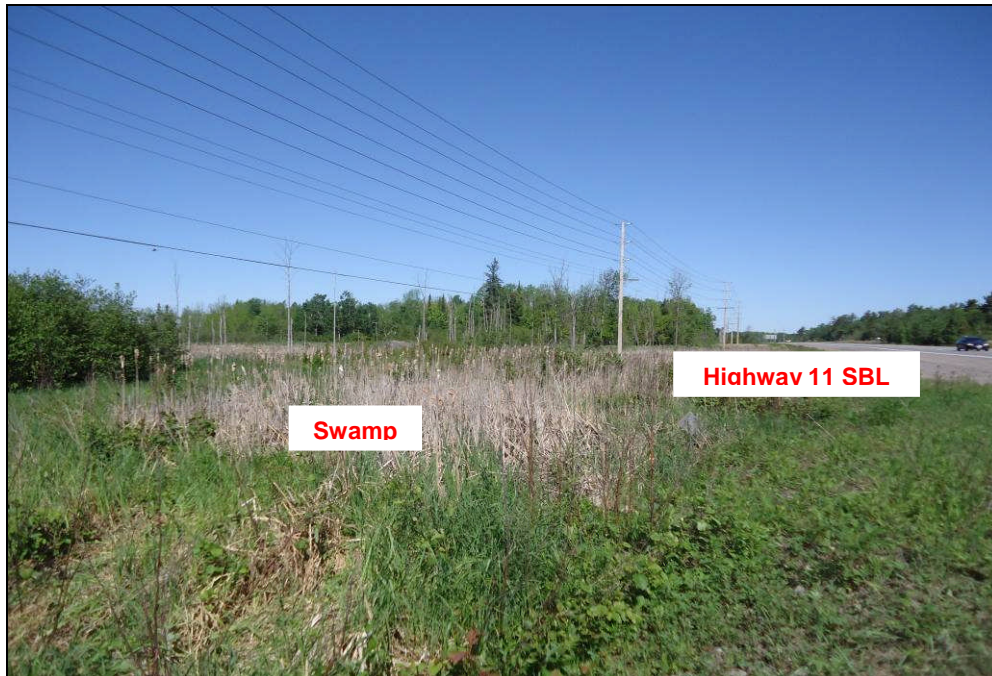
A: Looking north from west embankment slope of SBL of Highway 11. Borehole 11-1 was drilled at this location where is near the west abutment of Ramp E-S structure of Highway 11/Highway 17 interchange. (June 5, 2013)
